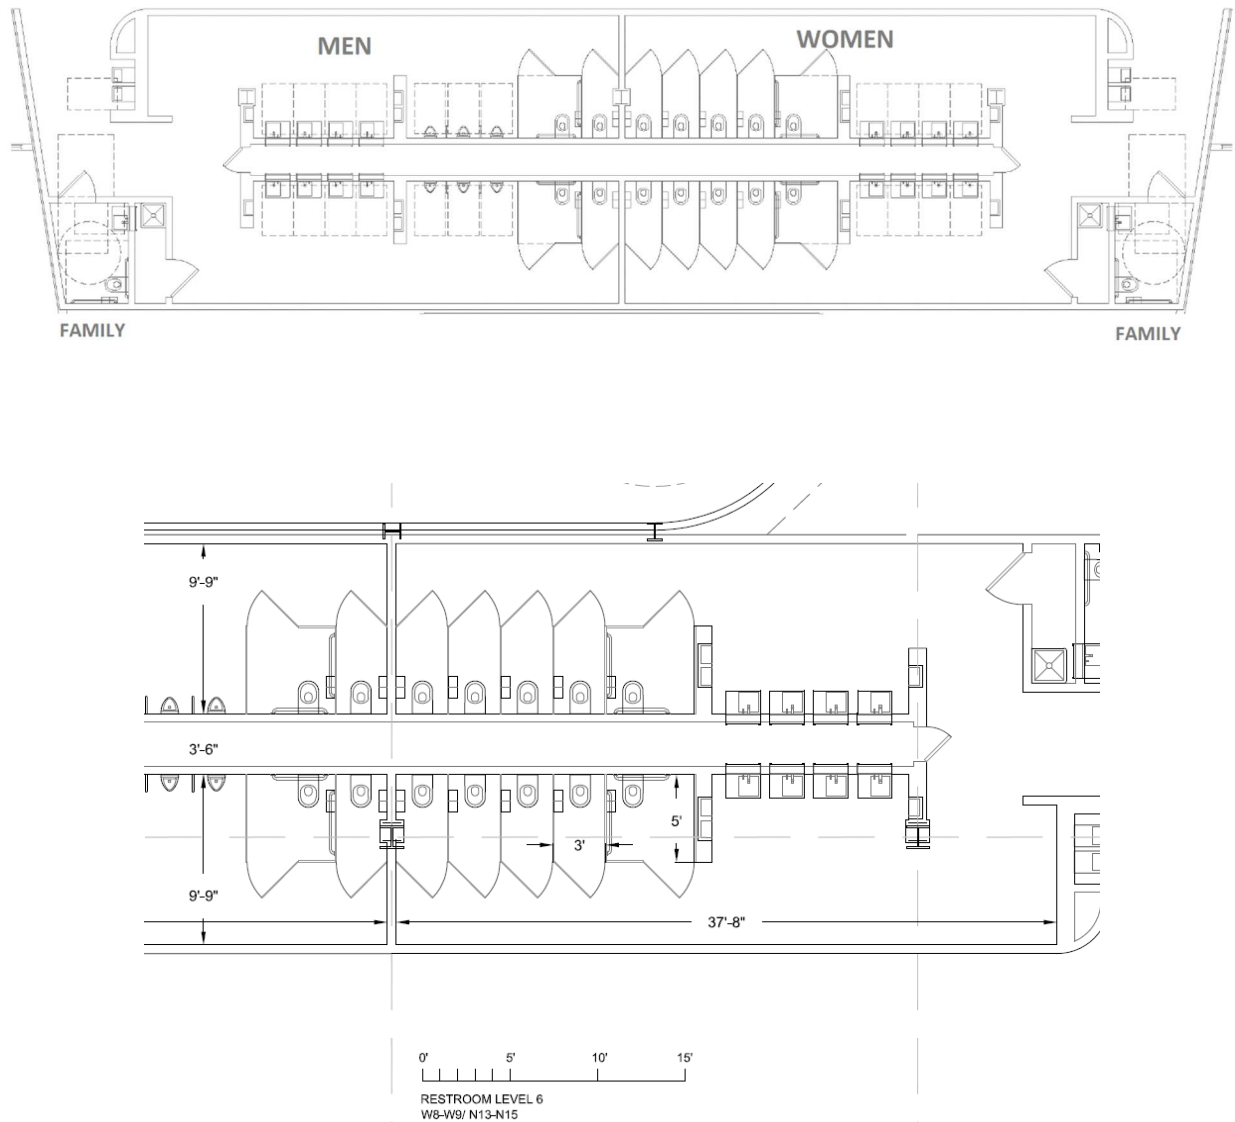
(a) - Typical Restroom Layout (Level 6)
